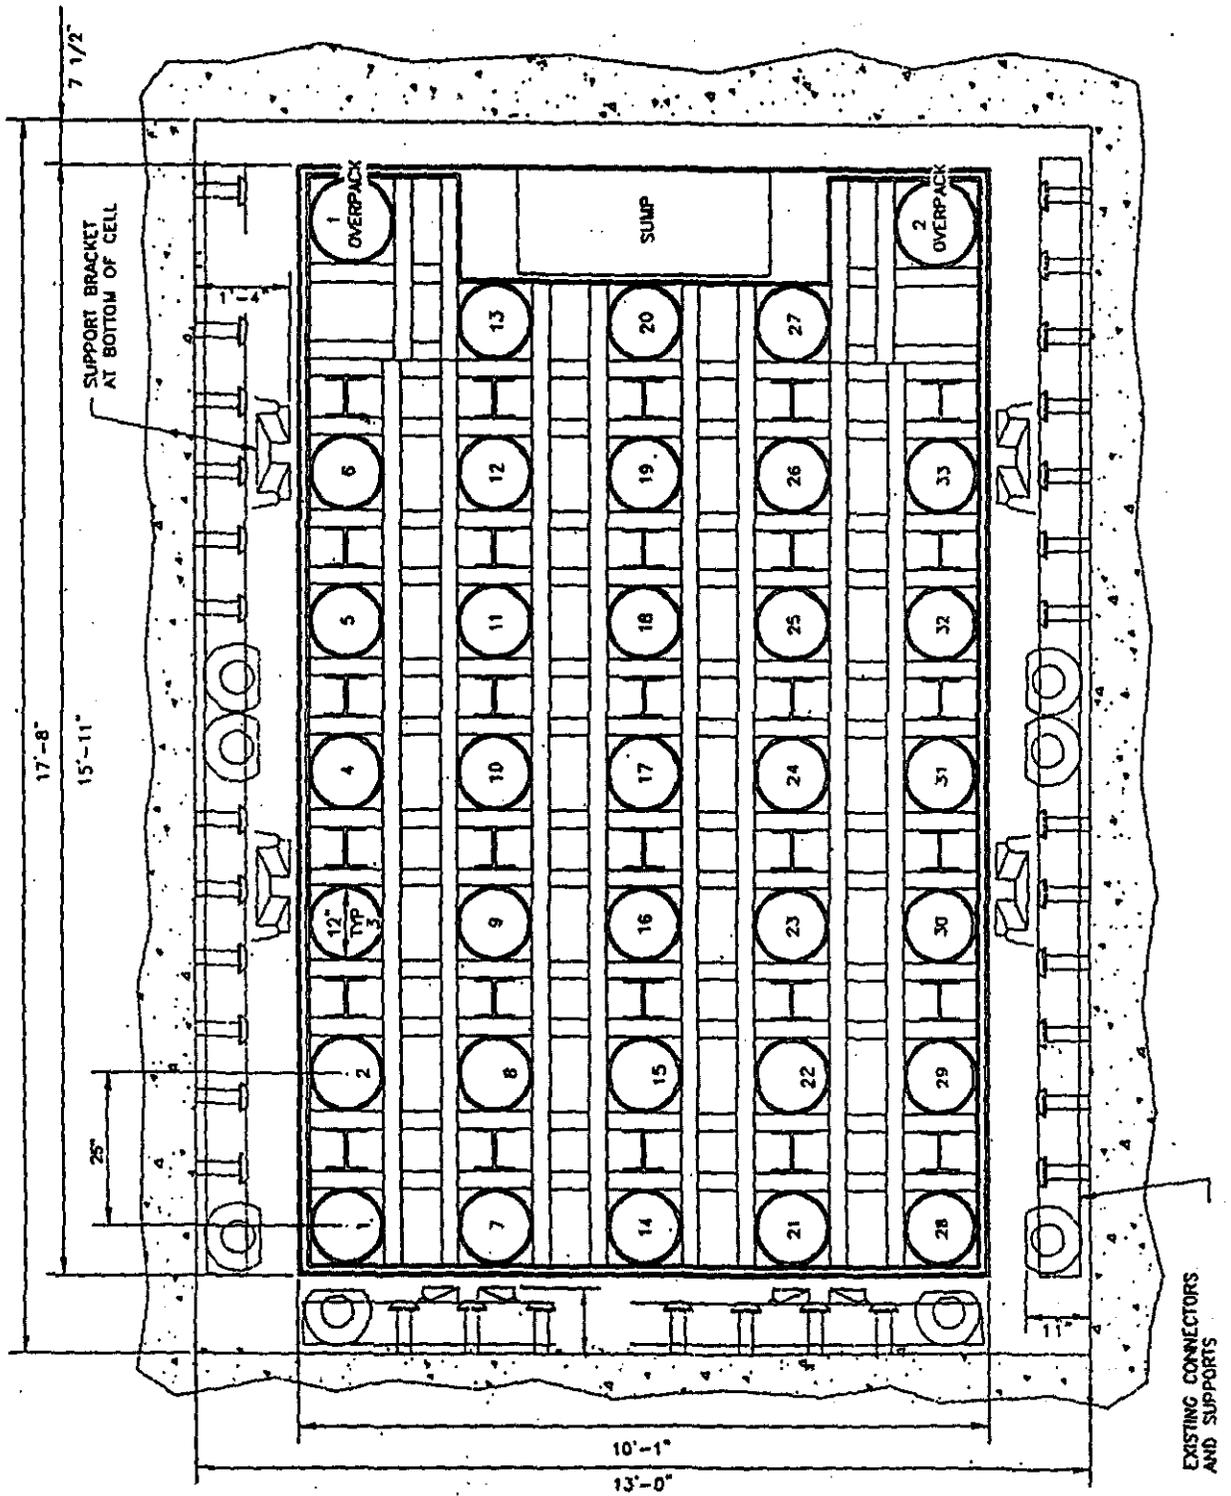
Typical Arrangement Type 2 Containers in Container Storage Rack for Dry Process Cell (Top View).
